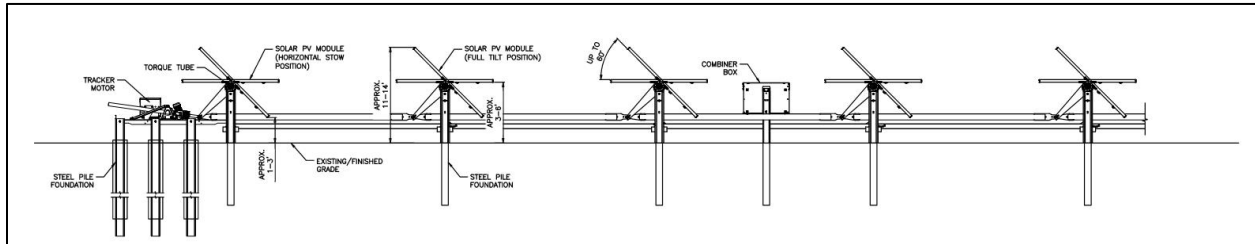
Single-Axis Tracker Solar PV Typical Elevation View
